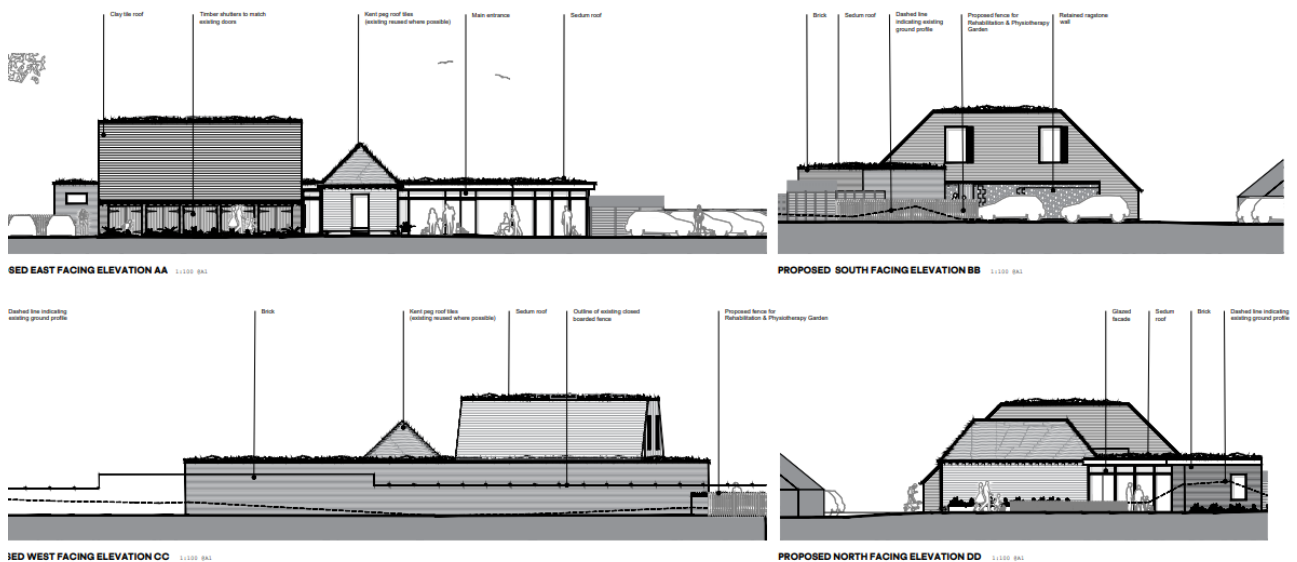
Proposed elevations. Replica granary with pitched roof shown in the centre of the east facing elevation (top left).
